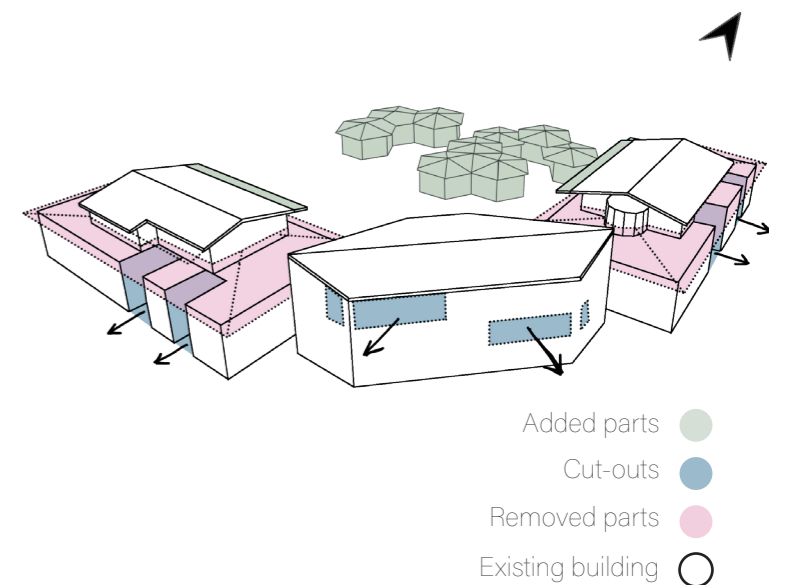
Illustration of transformed building with new honeycomb-shaped low-rise structures.
